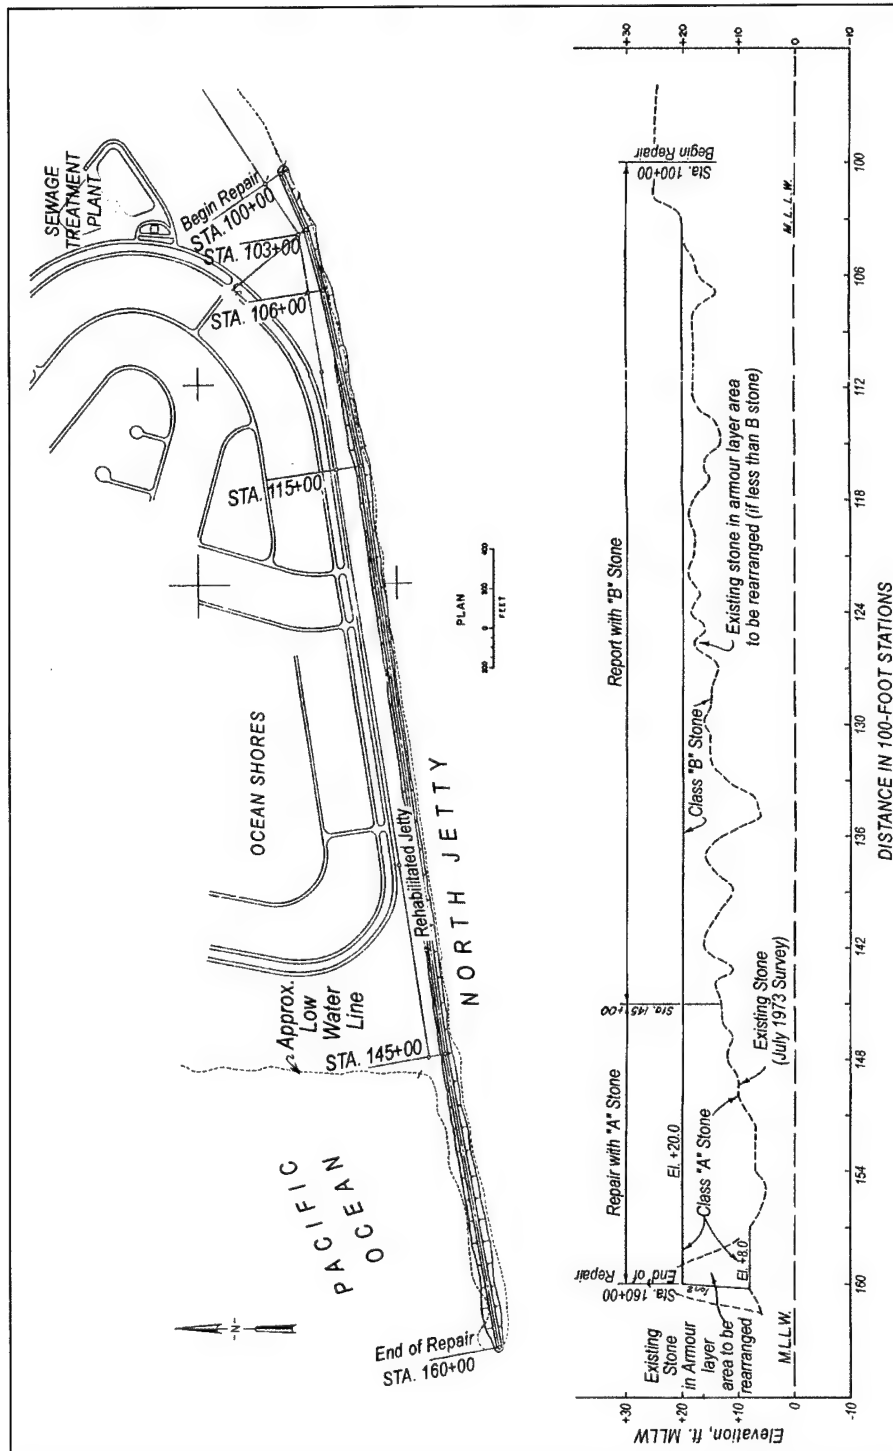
North jetty profile showing crest elevation between sta 100+00 and 160+00 based on a 1973 survey. The plan view shows station locations on profile (modified from USAED, Seattle, 1974, Plate 2)
